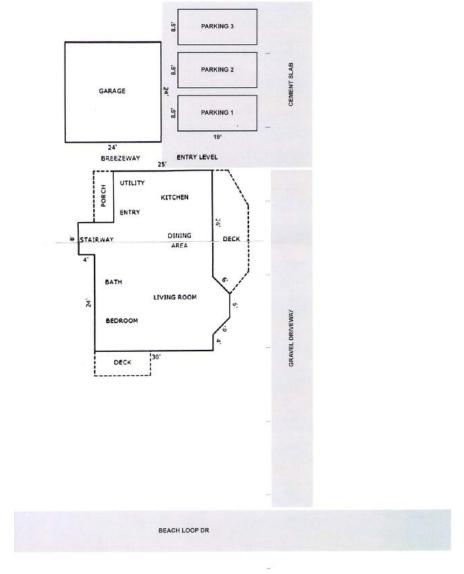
Applicant's parking site plan. Three off-street parking spaces are provided.
